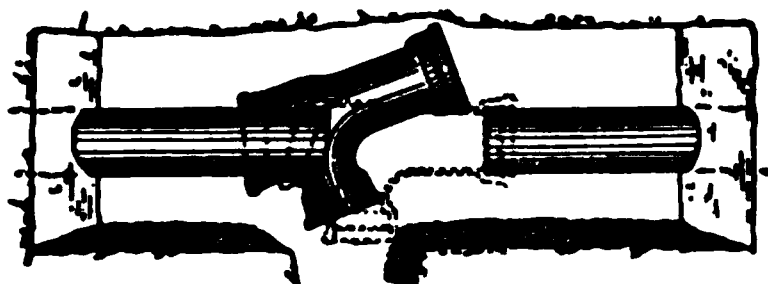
Method of "Springing" in a Fitting (to be Avoided) without Use of Sleeve.
